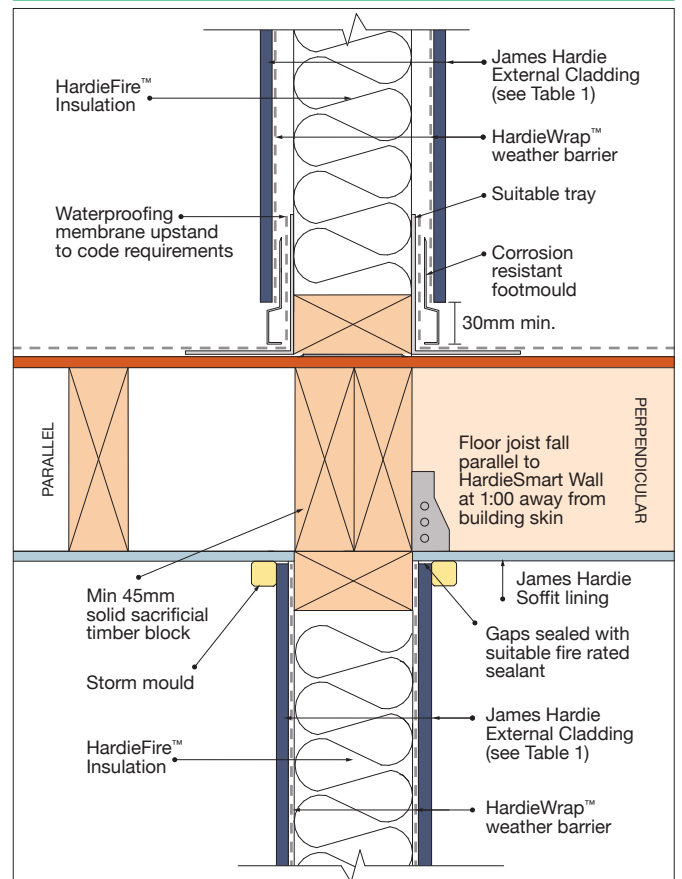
HARDIESMART™ BLADE WALL BALCONY FLOOR JUNCTION
